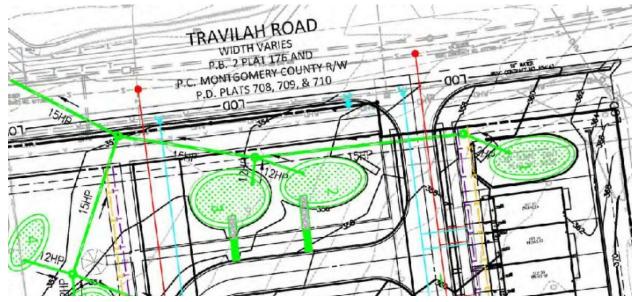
Proposed water (blue) and sewer (red) connections from applicant's utility plan
